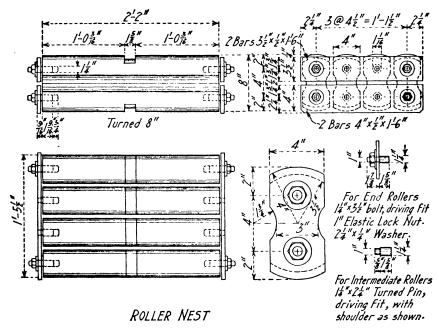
DETAILS OF SEGMENTAL ROLLERS FOR GIRDERS. CHICAGO, MILWAUKEE & St. Paul Ry.
